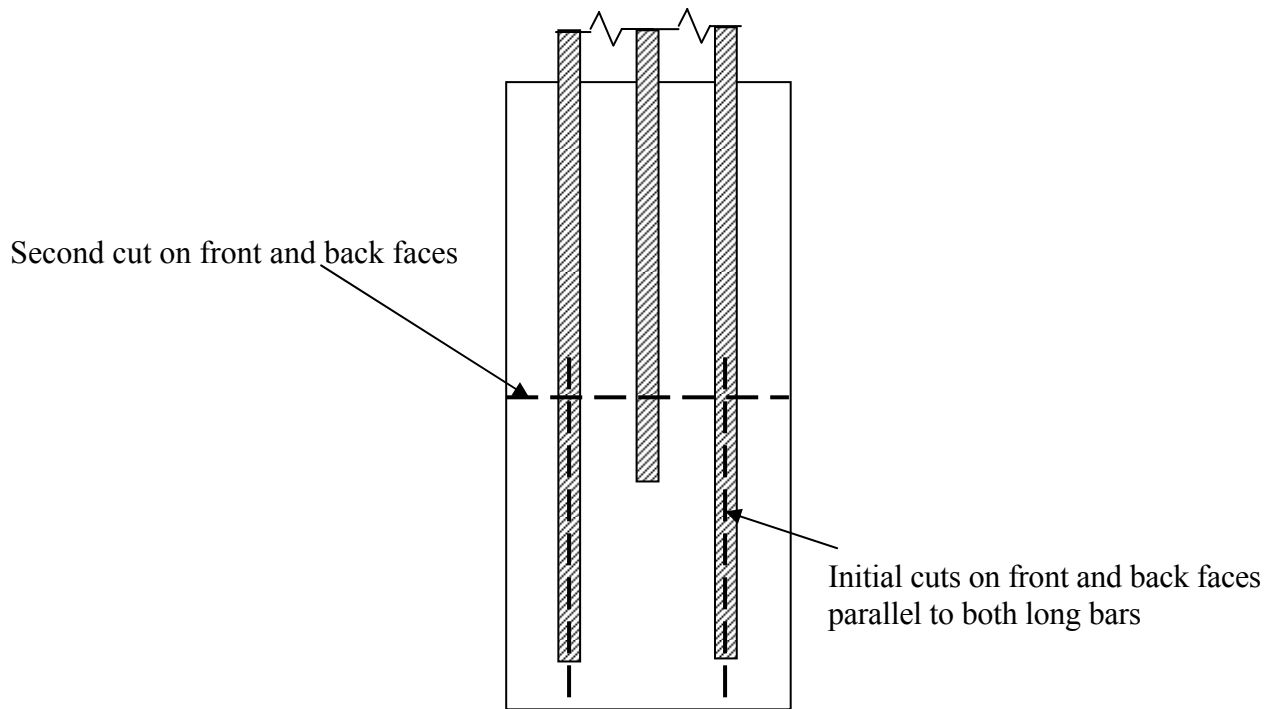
Chart. Concrete sectioning for 3BTC specimens.
